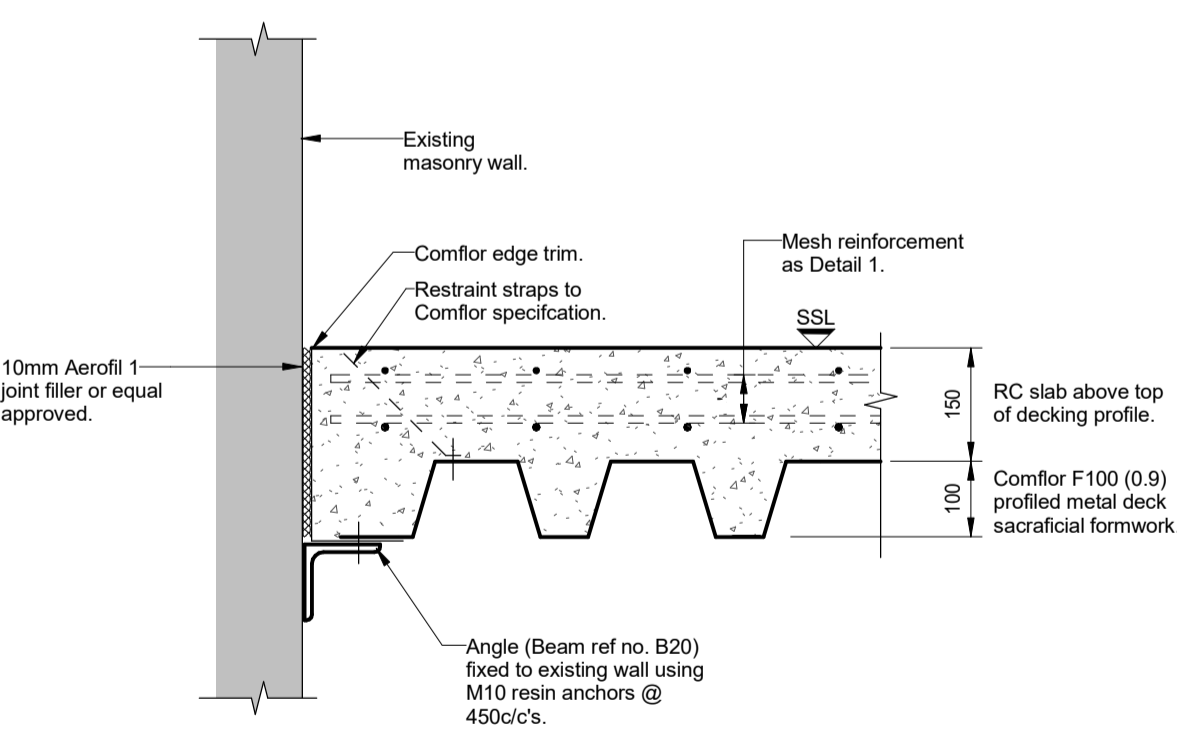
Proposed Slab Bearing at Openings in Wall
